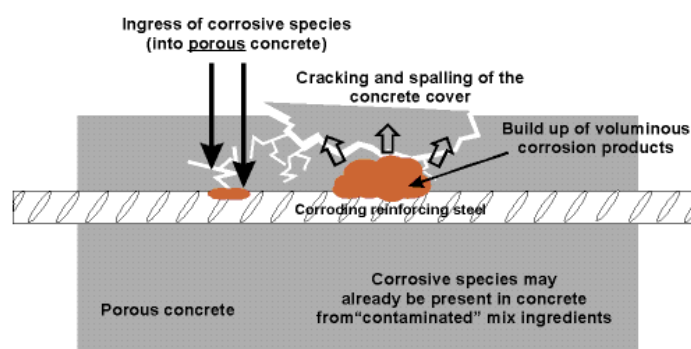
Cracking and spalling of the concrete cover [43].
